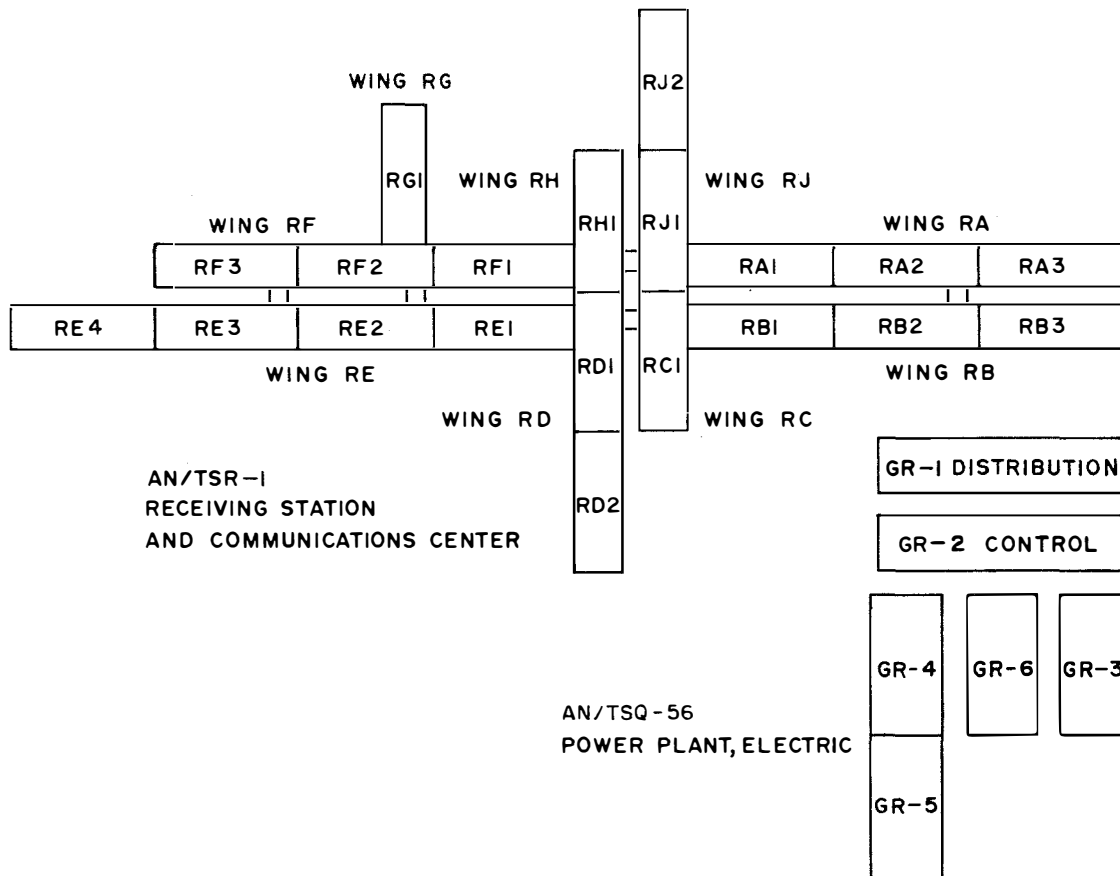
Site Plan, Transportable Communications Center and Receiver Station
